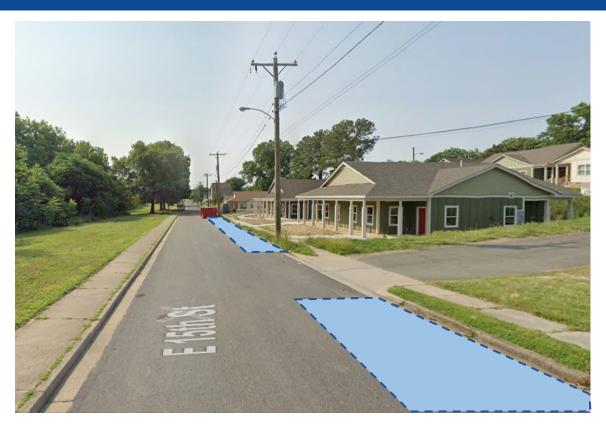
Proposed Permeable Pavement on East 15th Street from Maury Street Facing South
